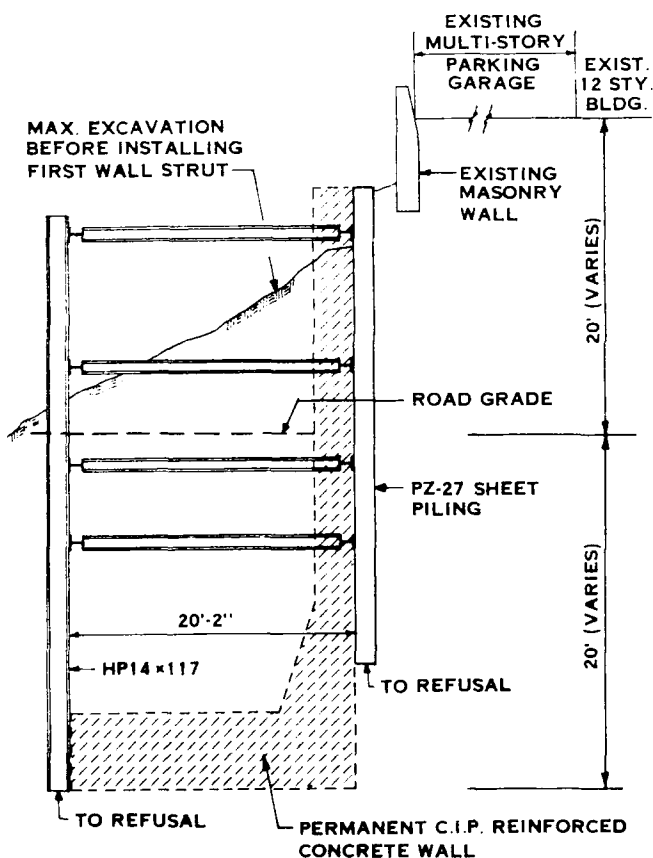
ORIGINAL RETAINING WALL SCHEME
